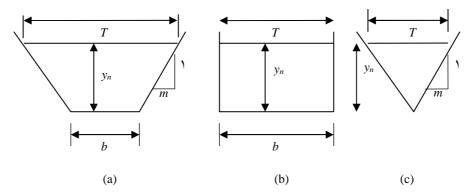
Canal Sections: (a) Trapezoidal Section, (b) Rectangular section, (c) Triangular Section.
